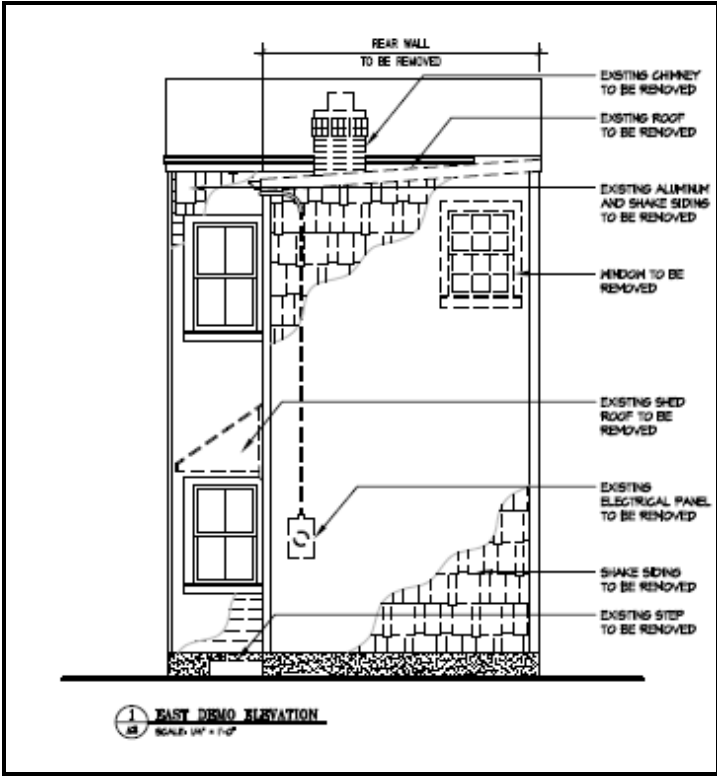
Existing east elevation showing areas of encapsulation/demolition.
